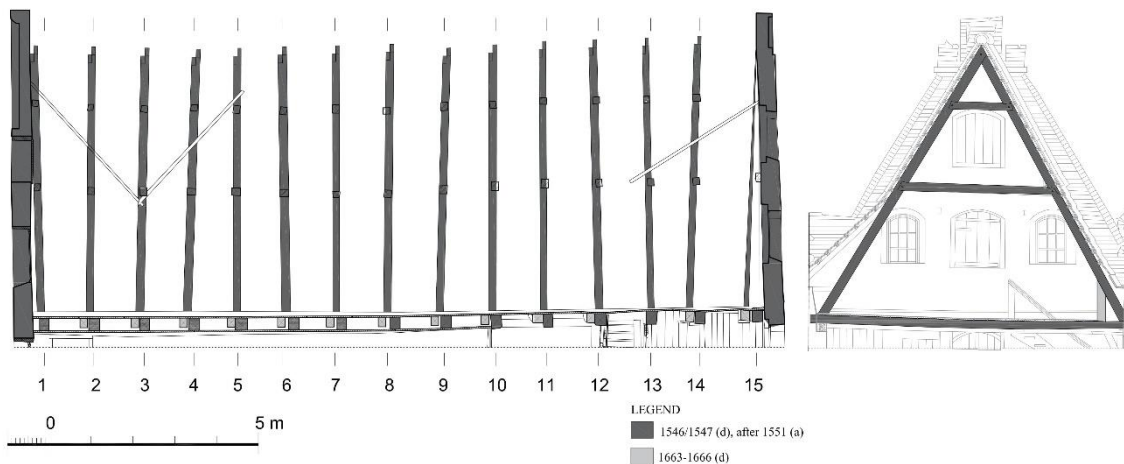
Toruń, 6 Mostowa Street. Roof structure of building B. Longitudinal and transverse cross-sections (compiled by U. Schaaf, M. Prarat).
